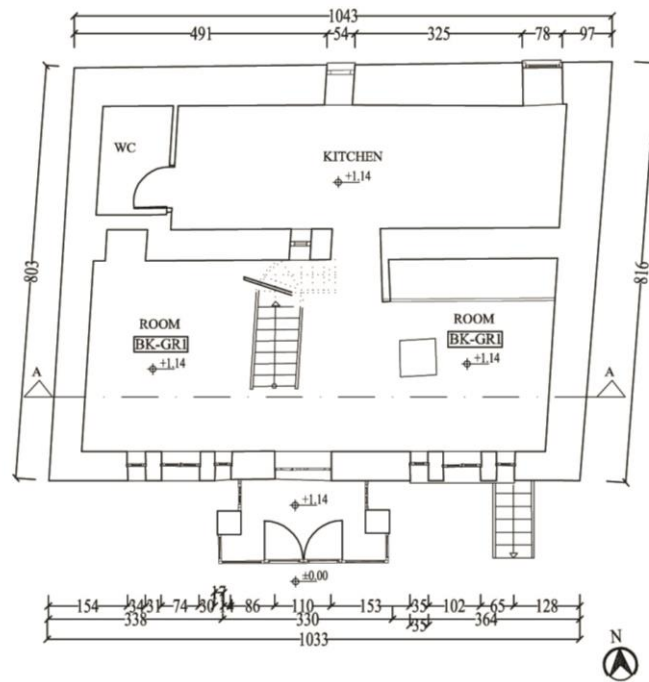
Ground floor plan of Boyacızade Konağı in 1/100 scale (Redrawn by author).
